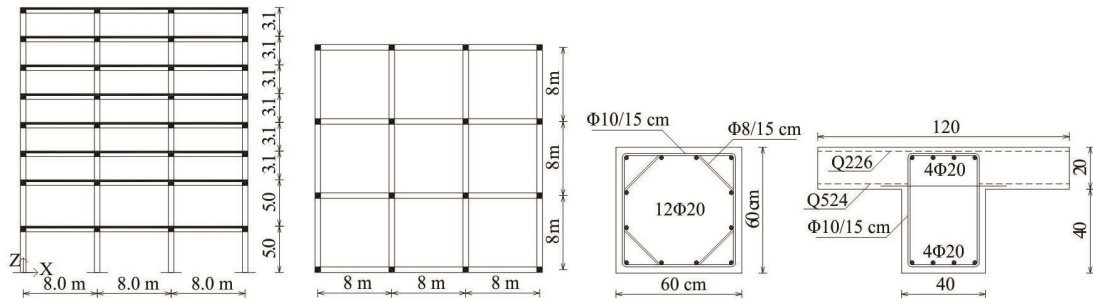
The elevation, plan view and reinforcement in cross-sections of the columns and beams of the building
